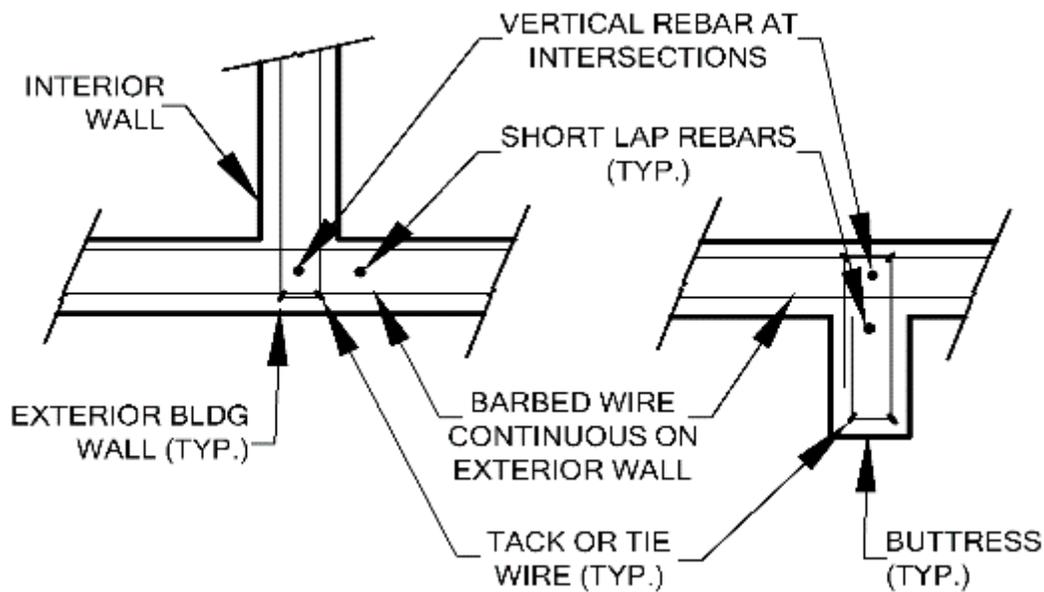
Barbed wire with both strands of barbed wire continuous along walls (right to left): a- At wall intersections run wire across adjacent wall, b- At buttress run wire across wall and return.
